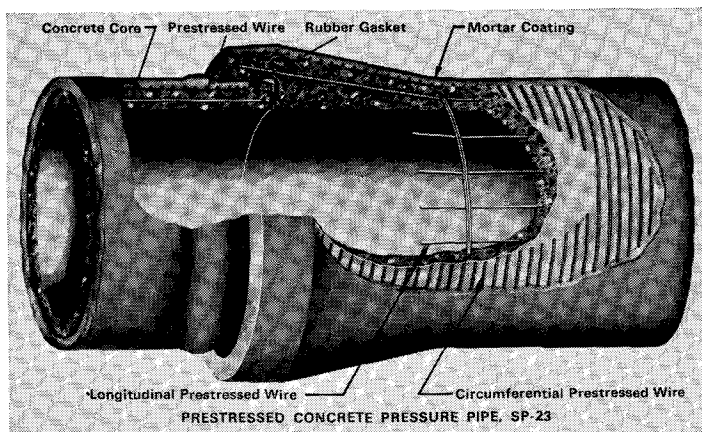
Prestressed Concrete Pressure Pipe with Rubber and Concrete Joint
